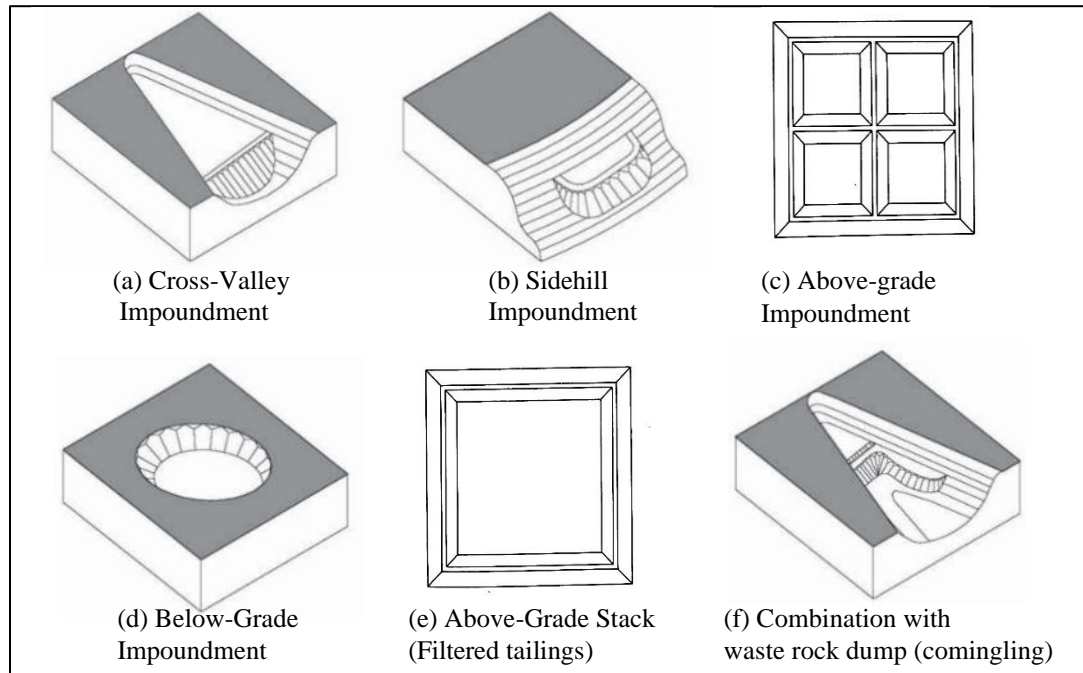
Tailings dam layout depending on the terrain of future dam location. (Kerr & Ulrich, 2011; Vick, 1983)
